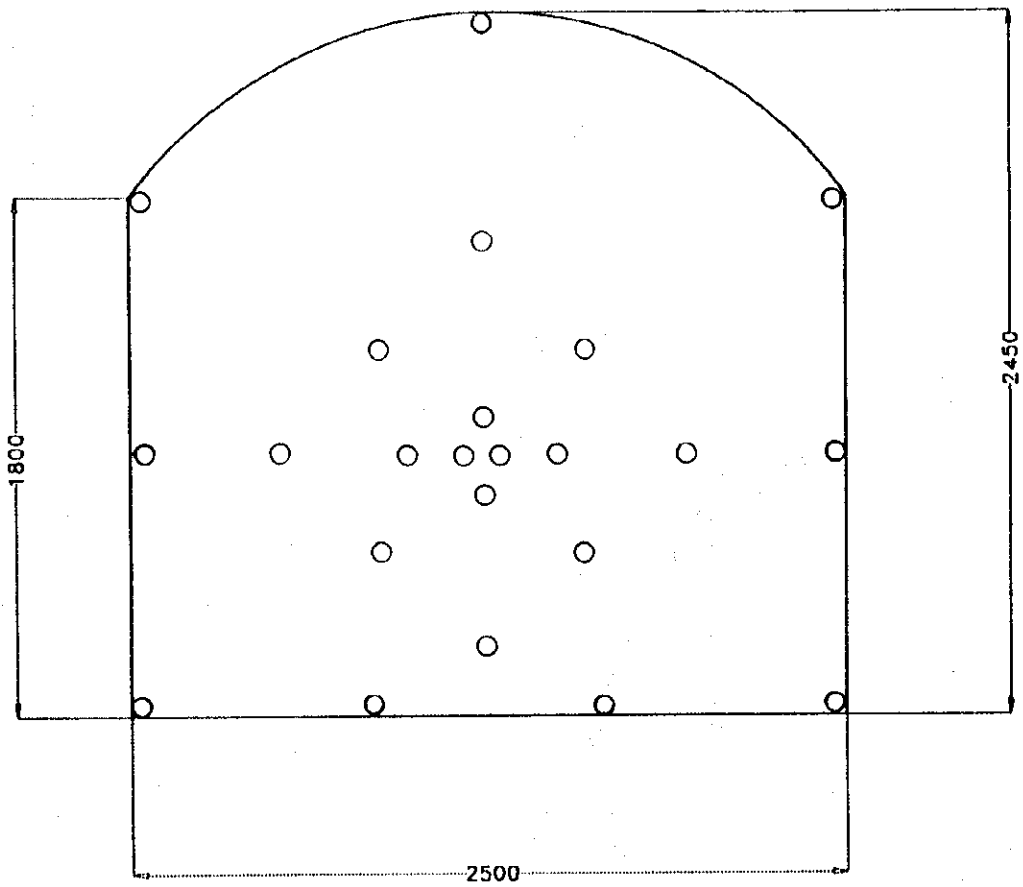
Drilling Pattern of the Tunnel (unit : mm)
